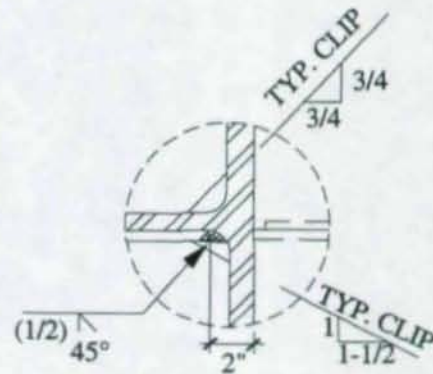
Specimens K1 to K3: Moment Connection Details
